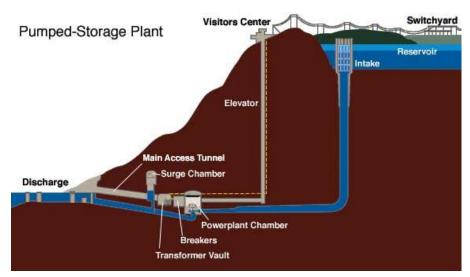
Schematic of a pumped-hydro storage plant (http://www.tva.gov/power/hydro.htm)
